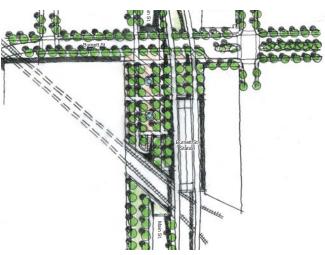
A transit plaza is recommended on top of the North Main Street tunnel.
